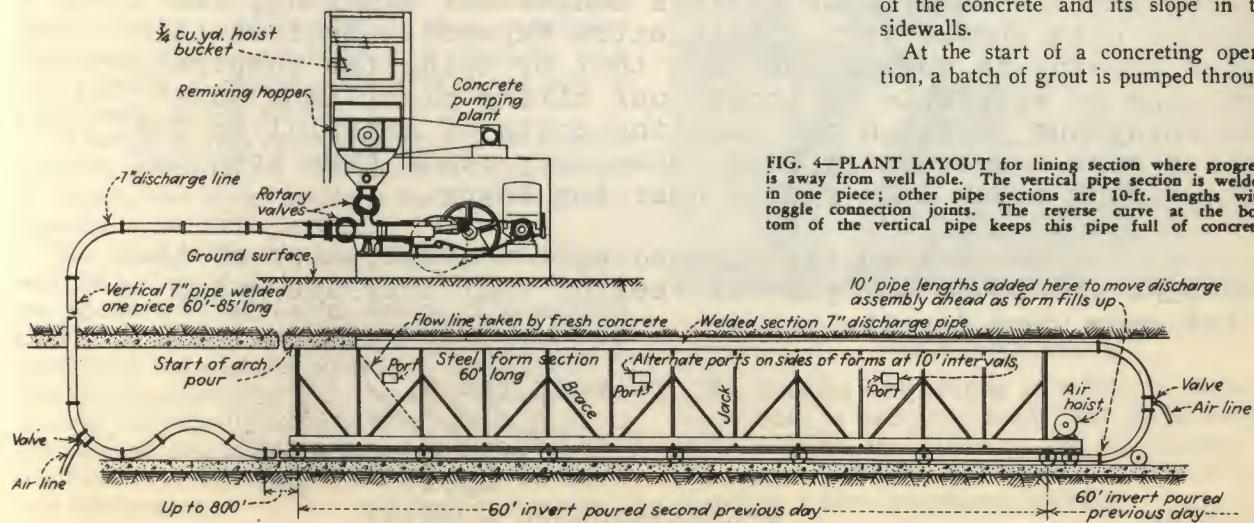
PLANT LAYOUT for lining section where progress is away from well hole. The vertical pipe section is welded in one piece; other pipe sections are 10-ft. lengths with toggle connection joints. The reverse curve at the bottom of the vertical pipe keeps this pipe full of concrete.
